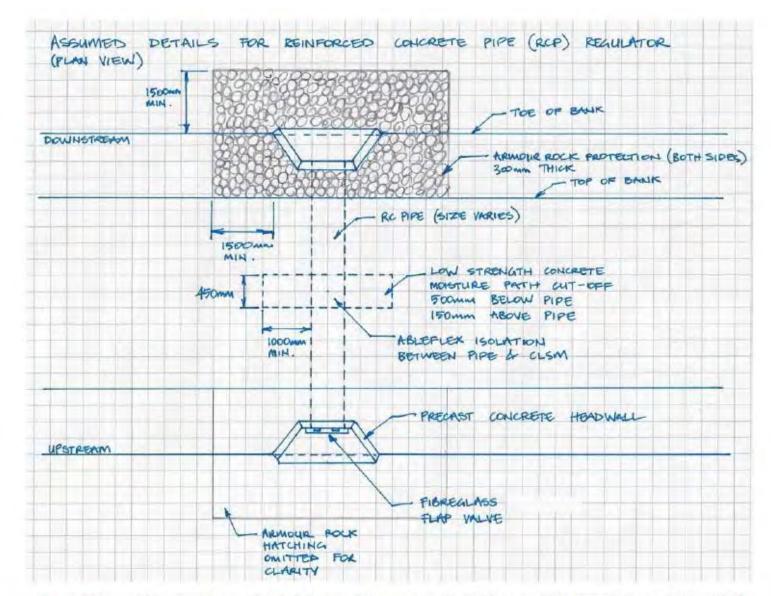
Plan view. Assumed details for regulators constructed with precast Reinforced Concrete Pipe (RCP) Structures with precast Reinforced Concrete Box Culverts (RCBC) will be similar but they will have cast in-situ base slabs and wingwalls.
